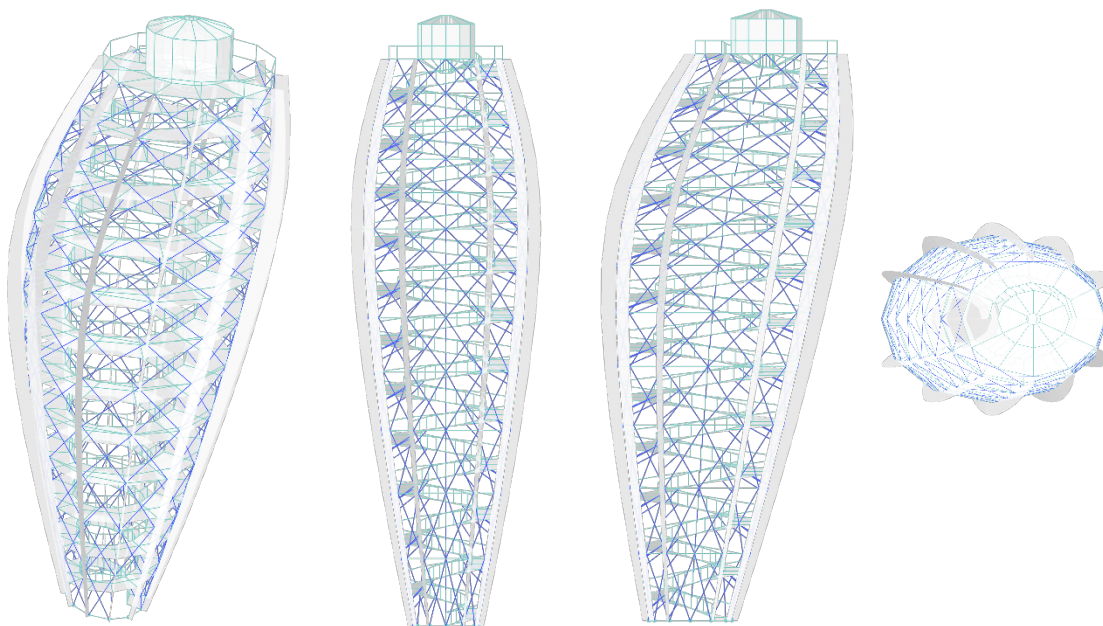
Drawing of Final Design (Perspective, Front, Side, Top)
